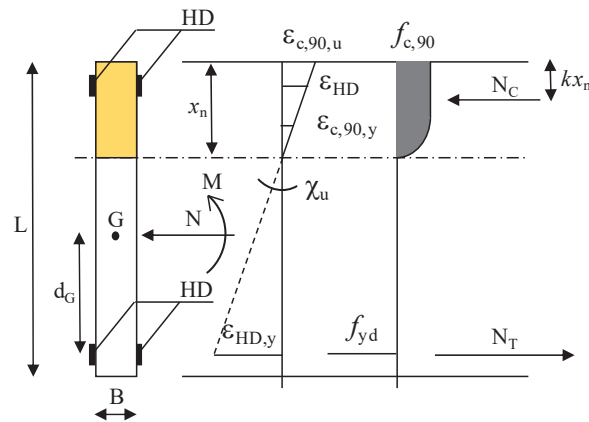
Failure condition for the timber-to-timber cross-section at ULS (i.e., stage III).
